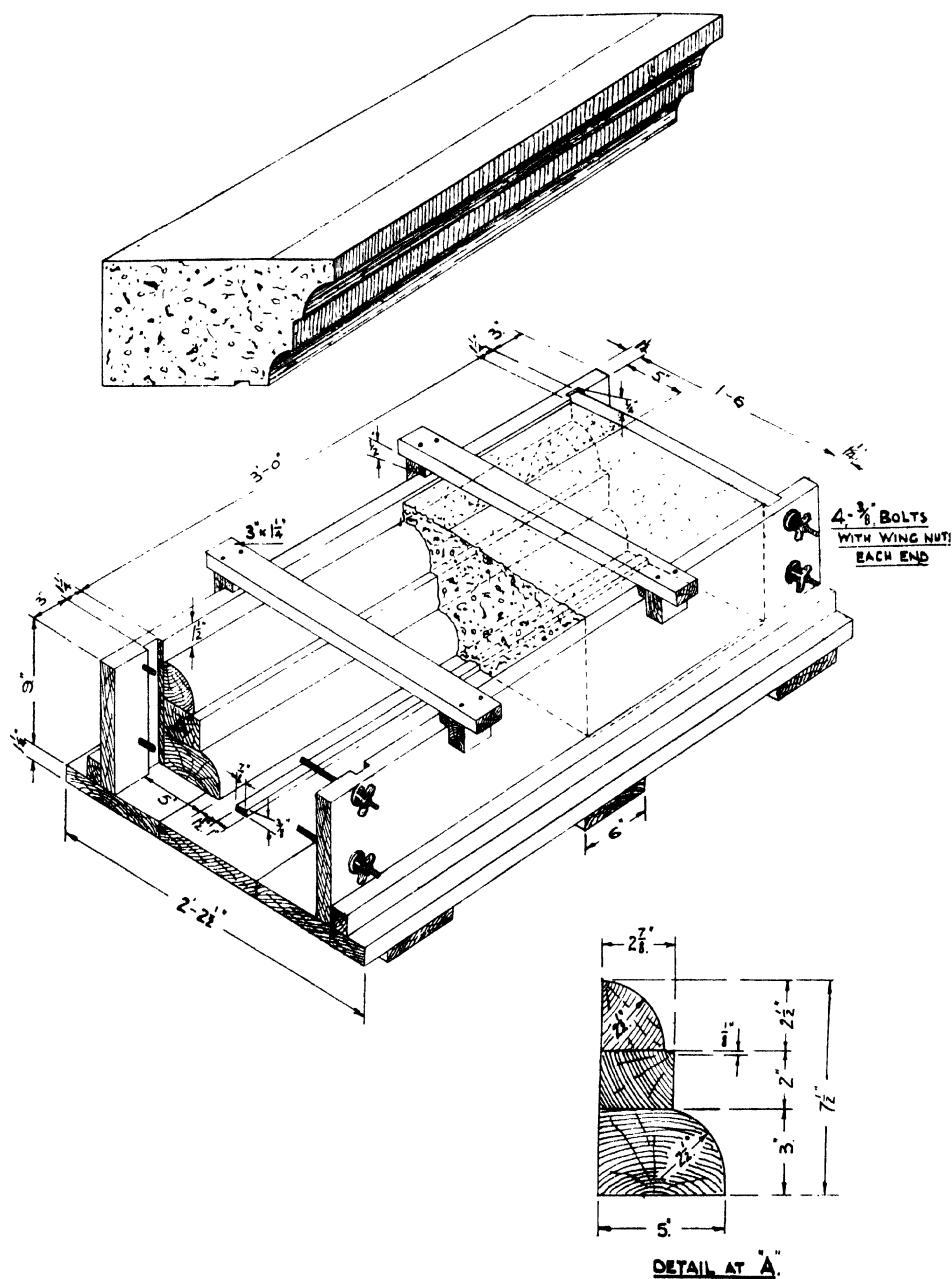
SECTION OF CONCRETE CORNICE AND MOULD FOR CASTING IT
